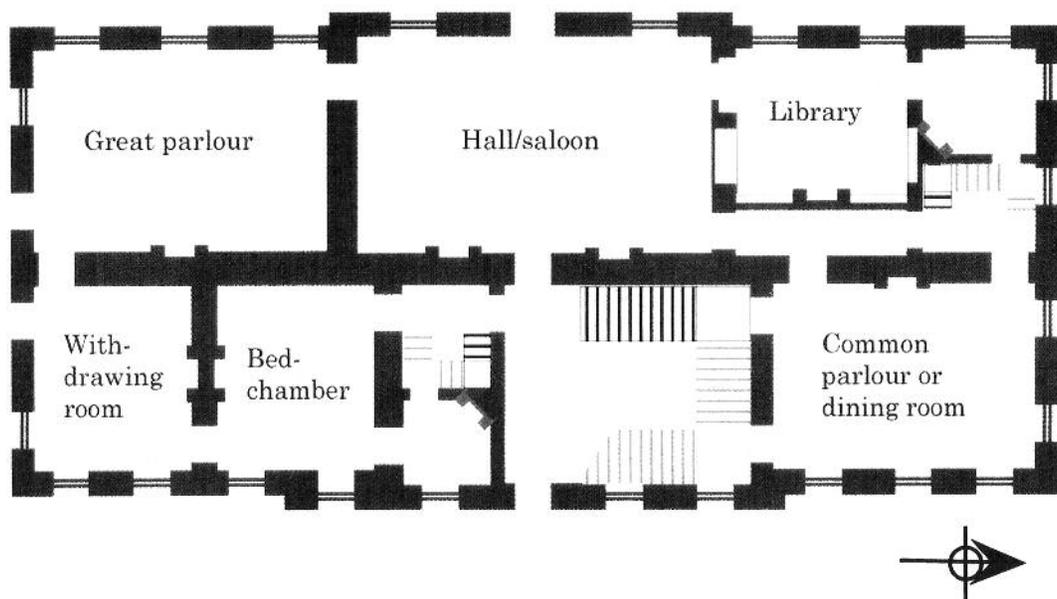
Reconstruction of the original ground floor plan of Wotton House. *Dr Patricia Smith.
